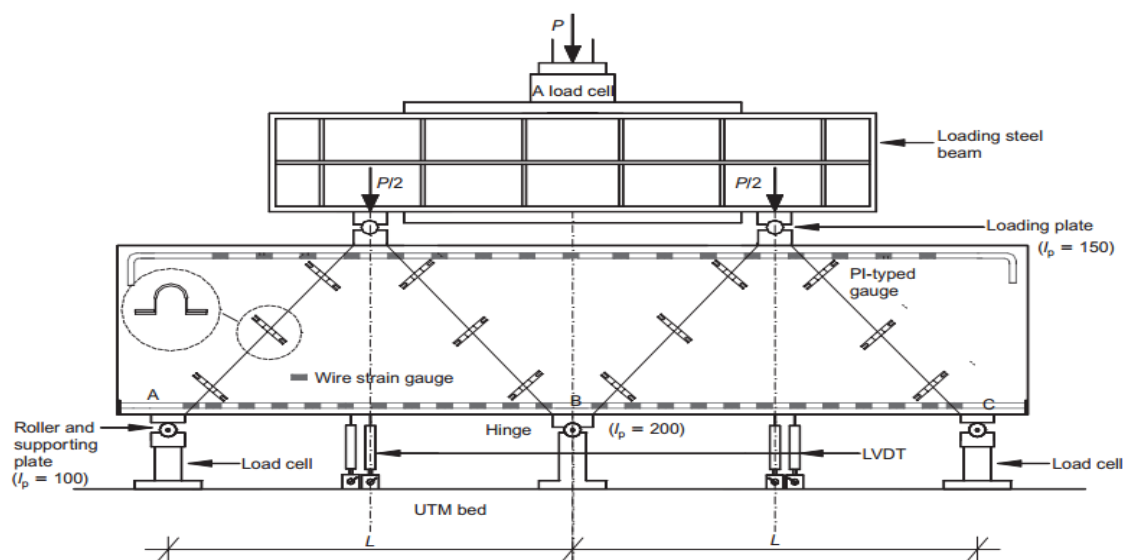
Test set-up of specimen (dimensions in mm) (Yang, and Ashour, 2007)
